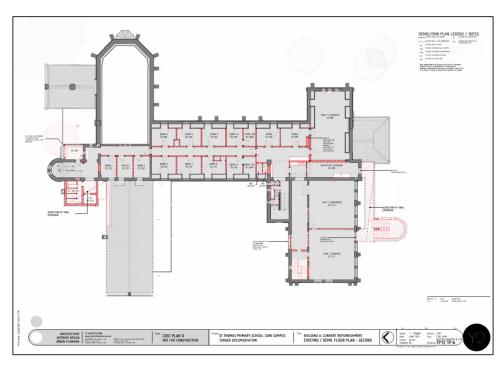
Second floor demolition plan (Source: Y2 Architecture)
